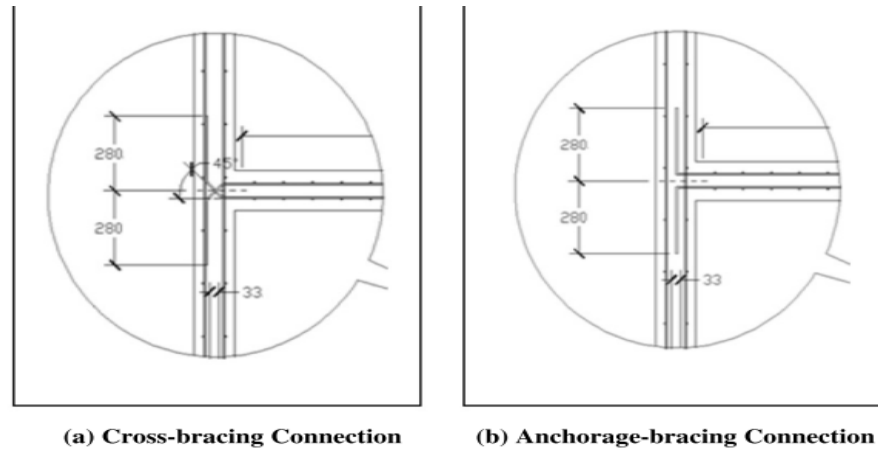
1 Connection on Detailing of both Specimens (Source:[5])
